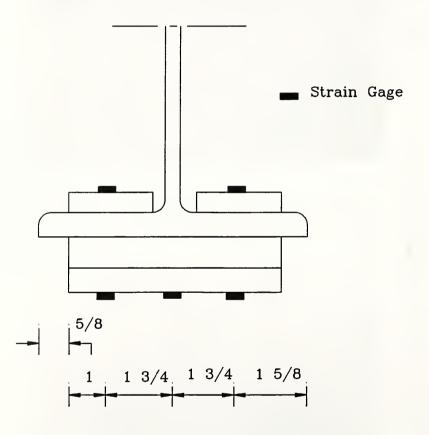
Strain Gage Locations. (Specimens NR1 and NR3)
